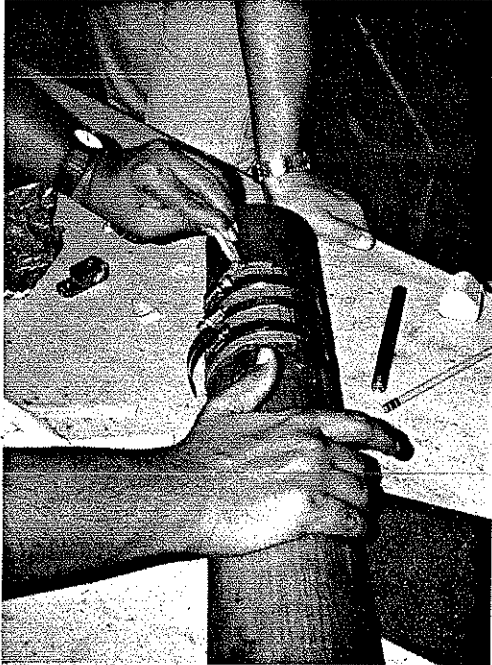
Repair of Stub-Coulmn P1S-SC
